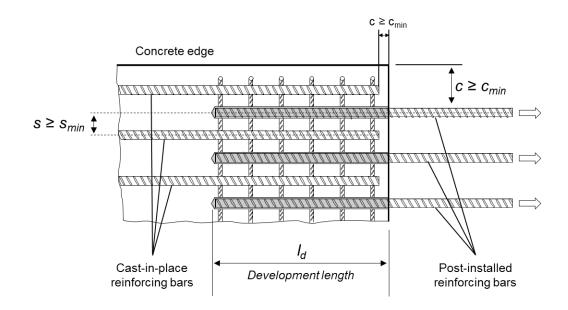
INSTALLATION PARAMETERS FOR POST-INSTALLED REINFORCING BARS
